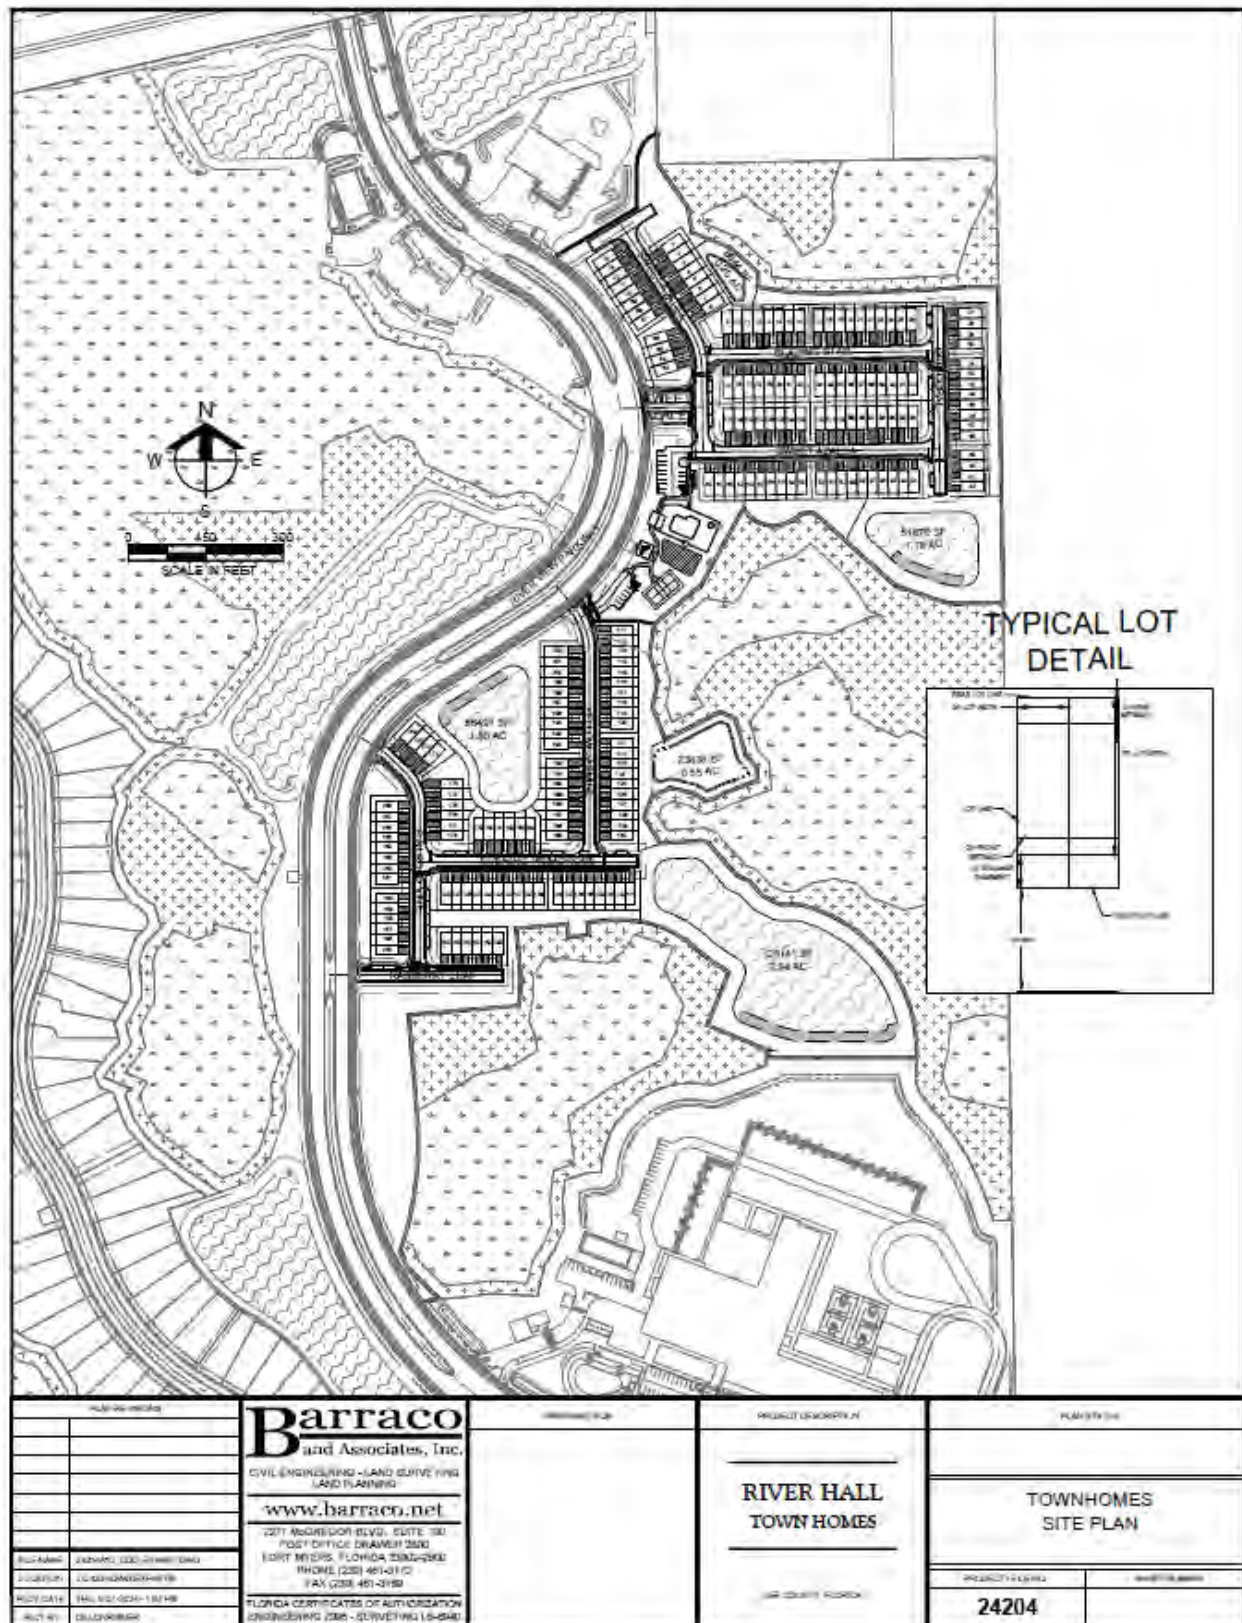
Exhibit D. Townhomes Site Plan (with Typical Lot Detail)
